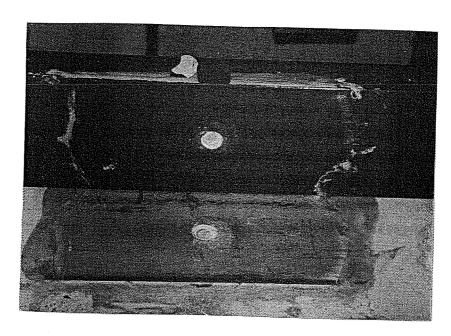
Epoxy interface completely debonded from steel section - Test 2-ME3h
